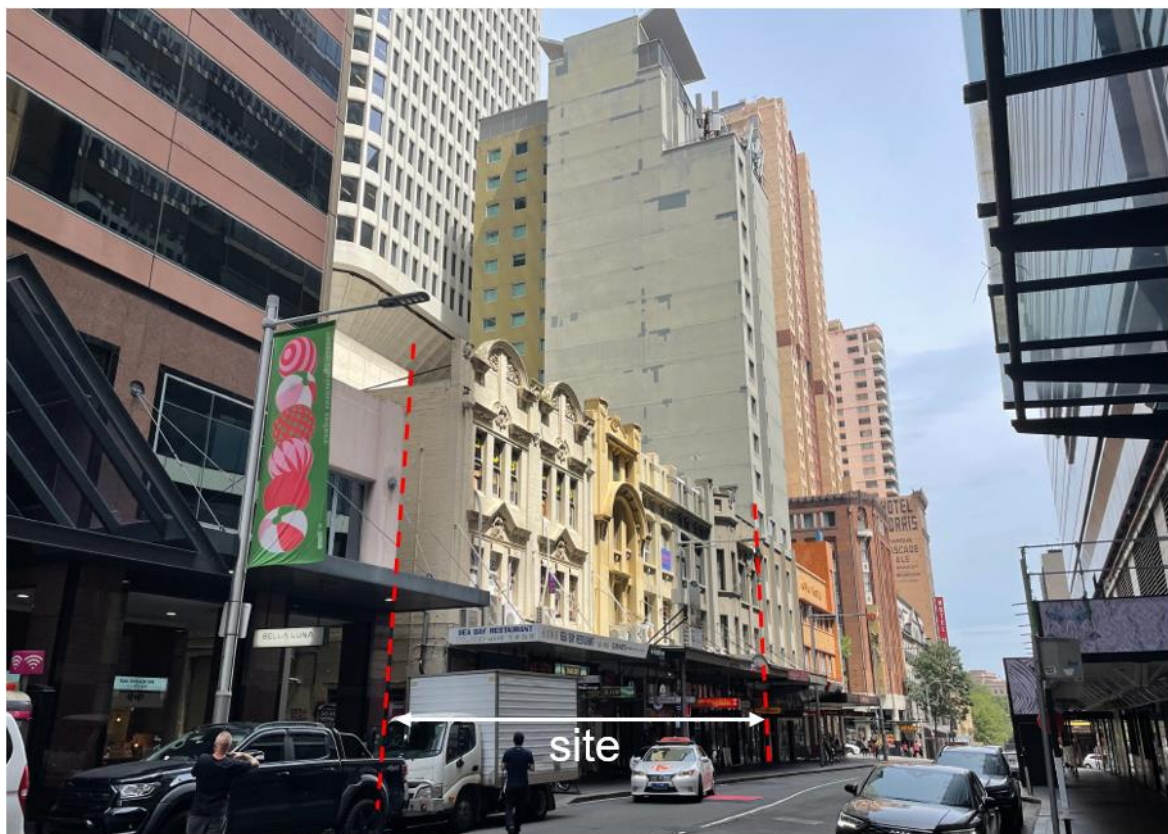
Site viewed from Pitt Street facing south towards Goulburn Street
